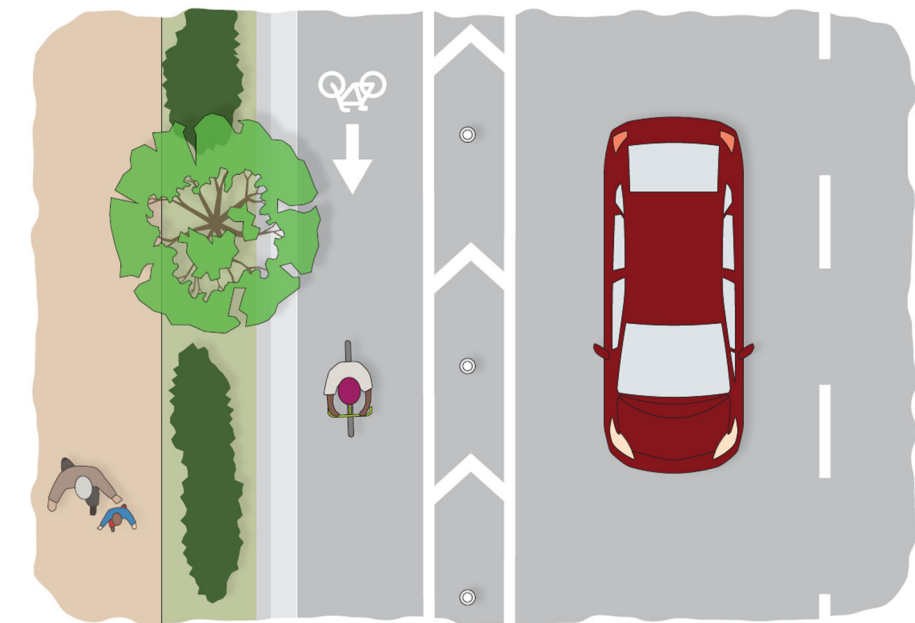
ONE-WAY CYCLE TRACK PLAN VIEW
